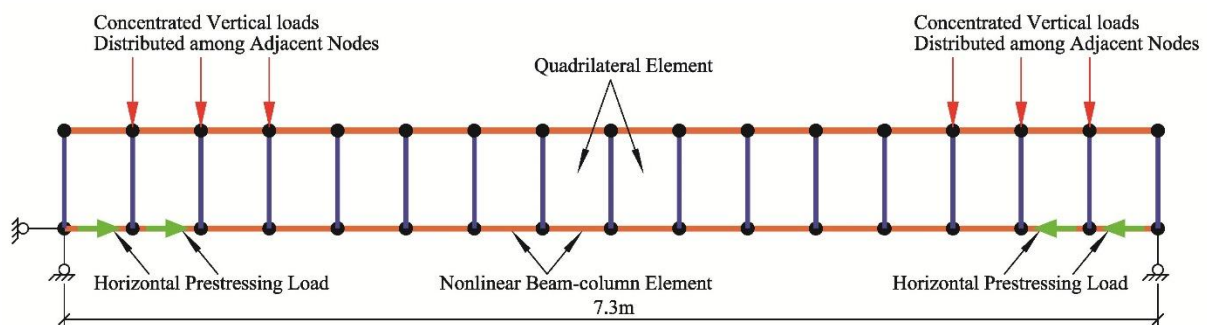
Finite element model of PSFC I-beams tested under web-shear.
